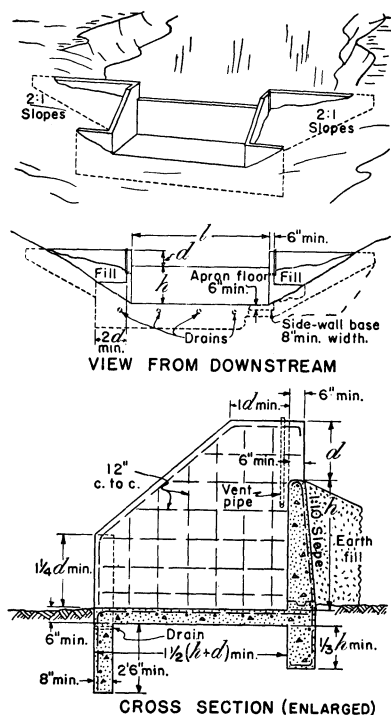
A design for a small concrete dam in which  $h$  does not exceed 5 feet.
